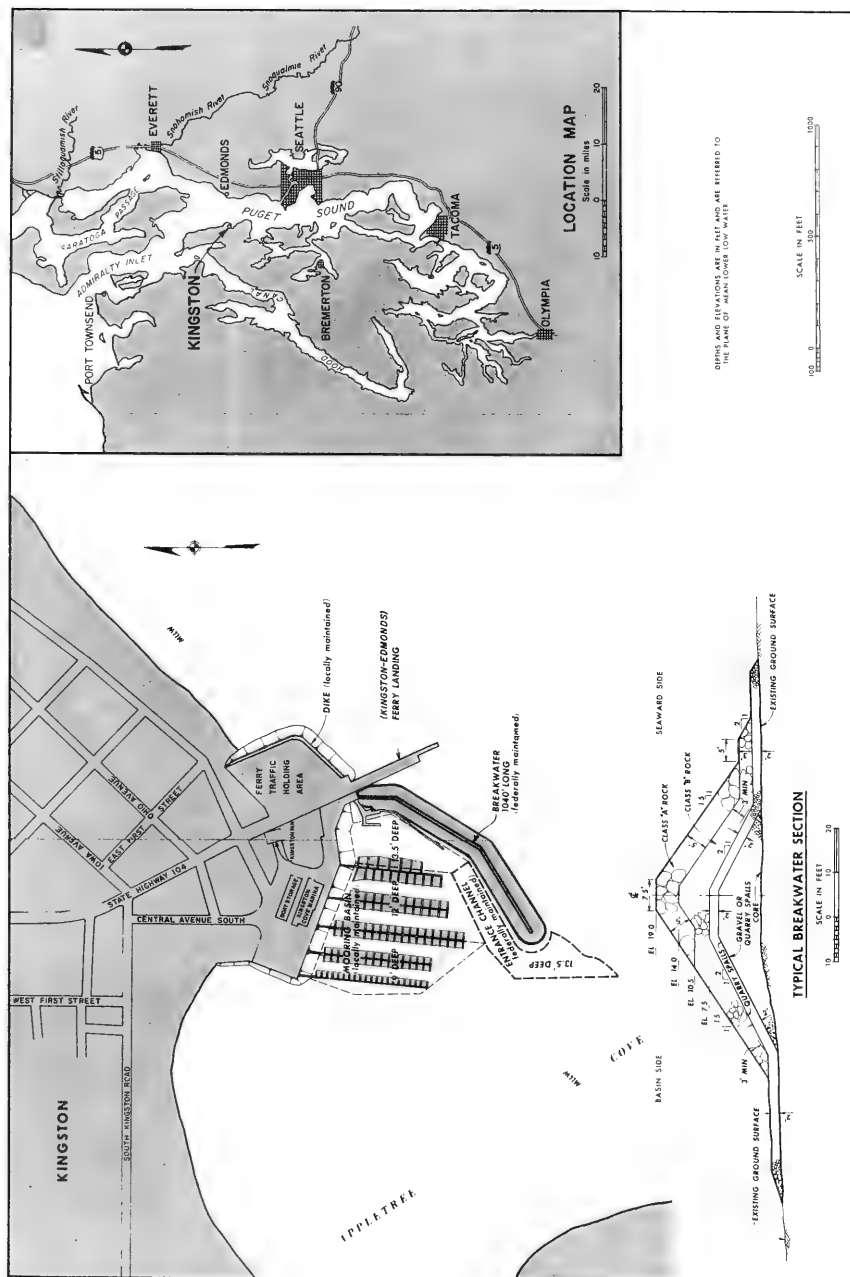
Site layout at Kingston Harbor, Washington (revised 1979)
